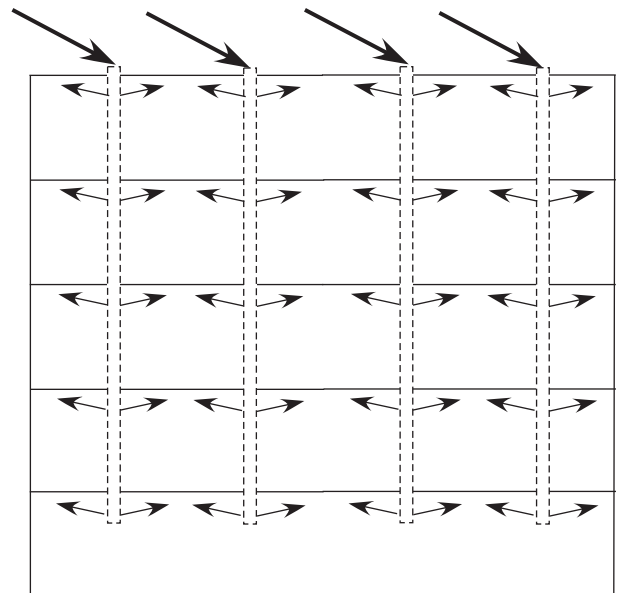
Basic concept of a system to deliver natural light via light pipes to a five level building.
